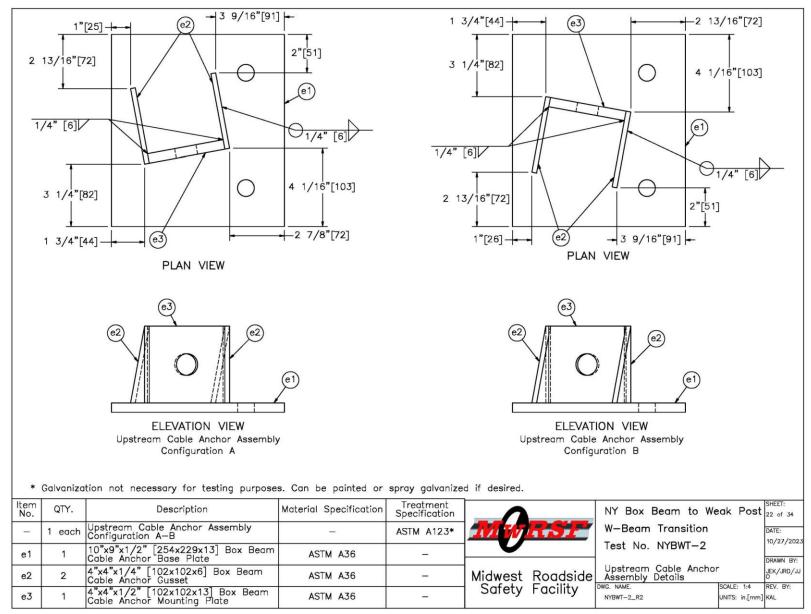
Upstream Cable Anchor Assembly Details Test No. NYBWT-2
